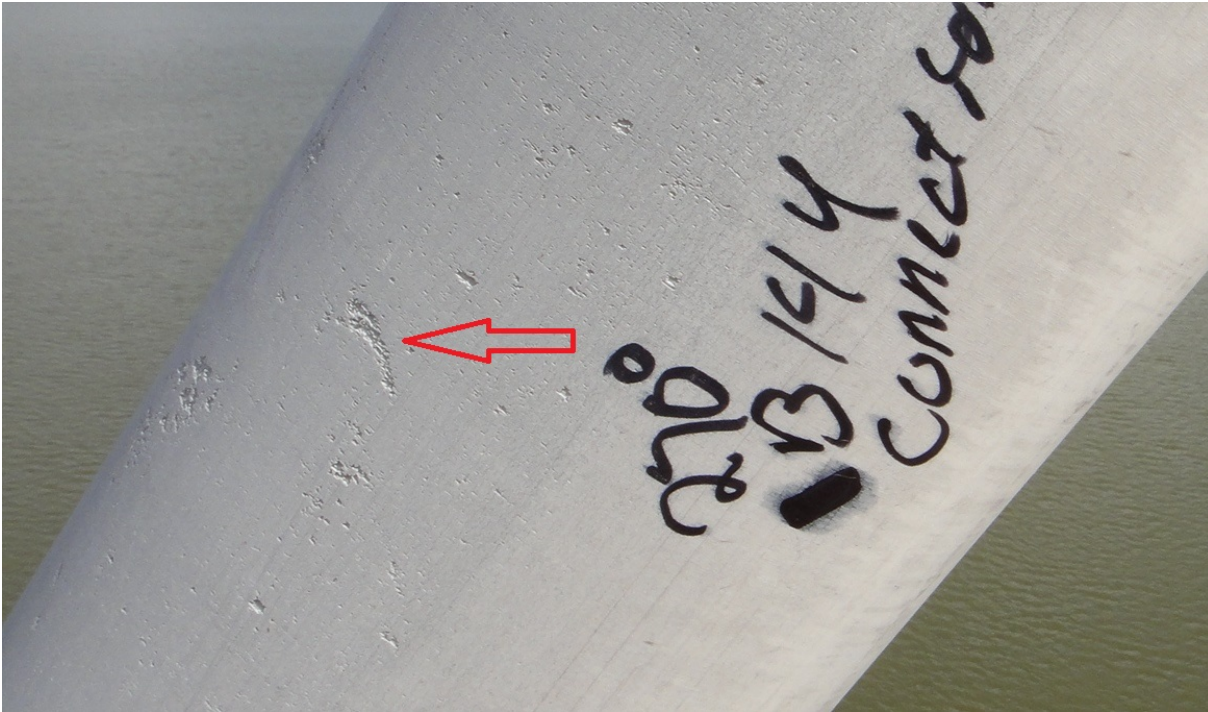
Spalling of Coextruded HDPE on Surface of a Connection Sleeve.
